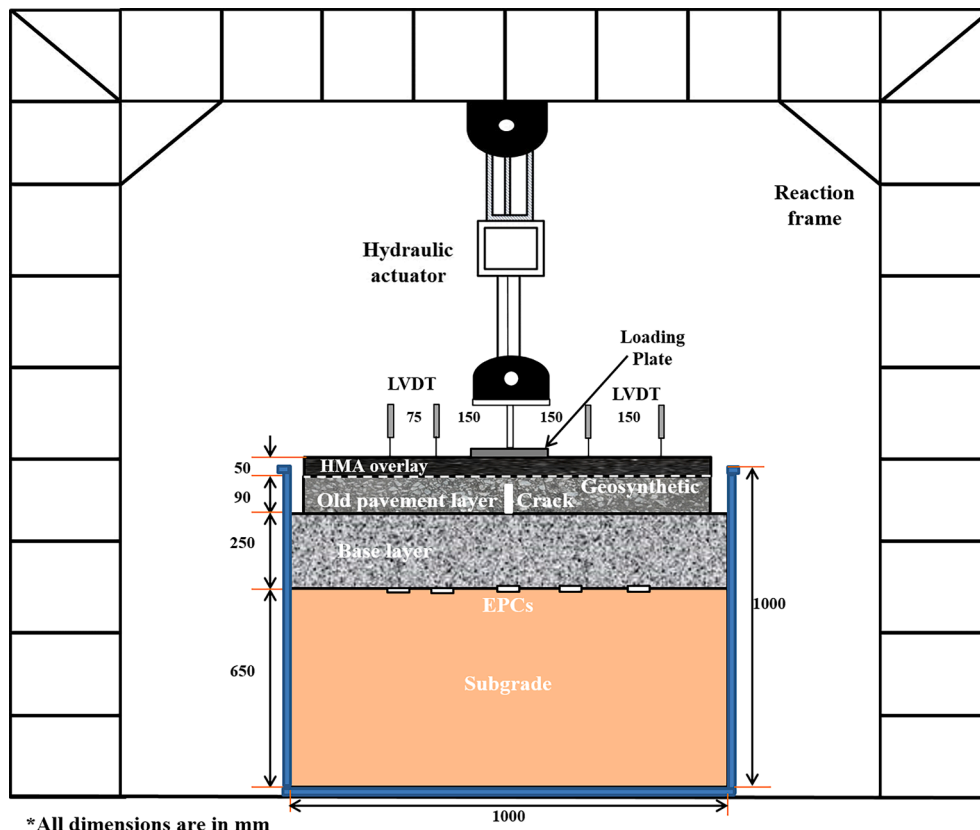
Schematic of Full-scale Instrumented Pavement model and loading system.
